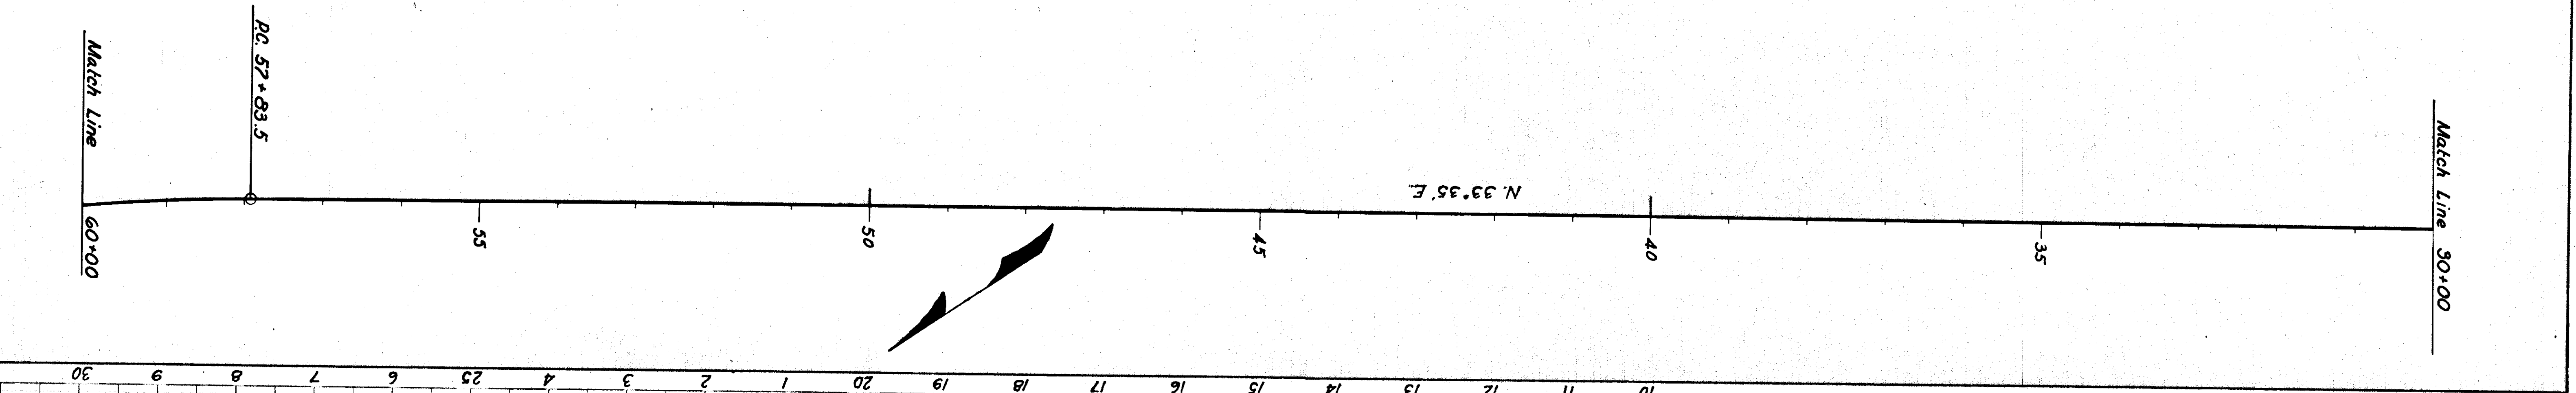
PLAN - PROFILE OF P.R. & R.E. STANDARD
